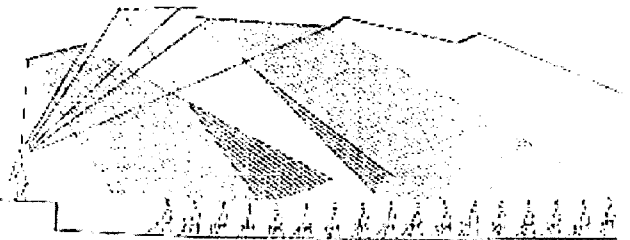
Sound reflecting on the ceiling and side walls in the theater
